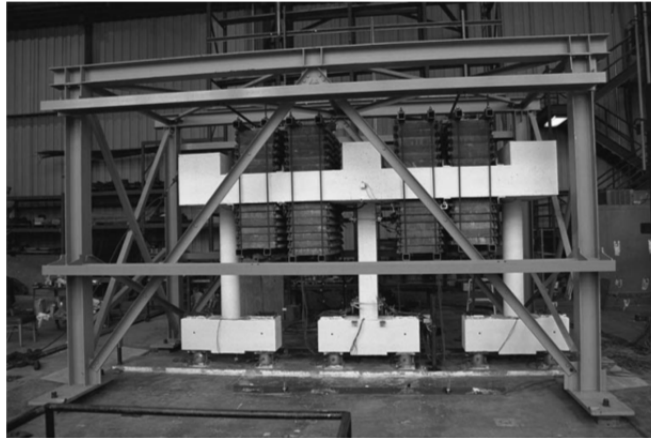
Full-scale specimen for gravity load collapse tests (Elwood and Moehle, 2003)
